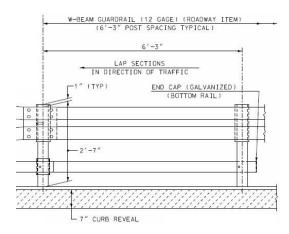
NHDOT T4 AGT upstream w-beam section (VTrans similar except bottom bar and sidewalk).
